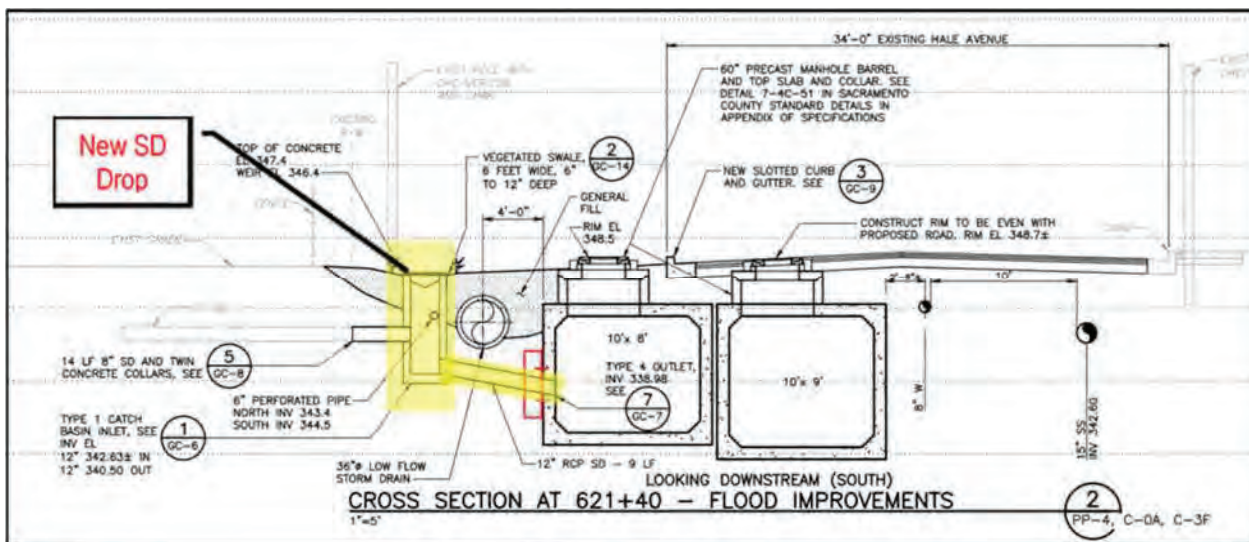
Cross Section Example of Potential Drop SD Manhole and 27-inch SD
